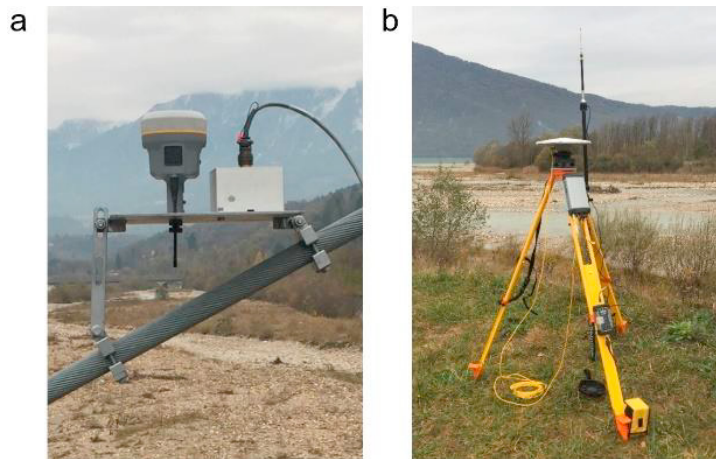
(a) Systems configuration on the footbridge cable; (b) Base Station.
